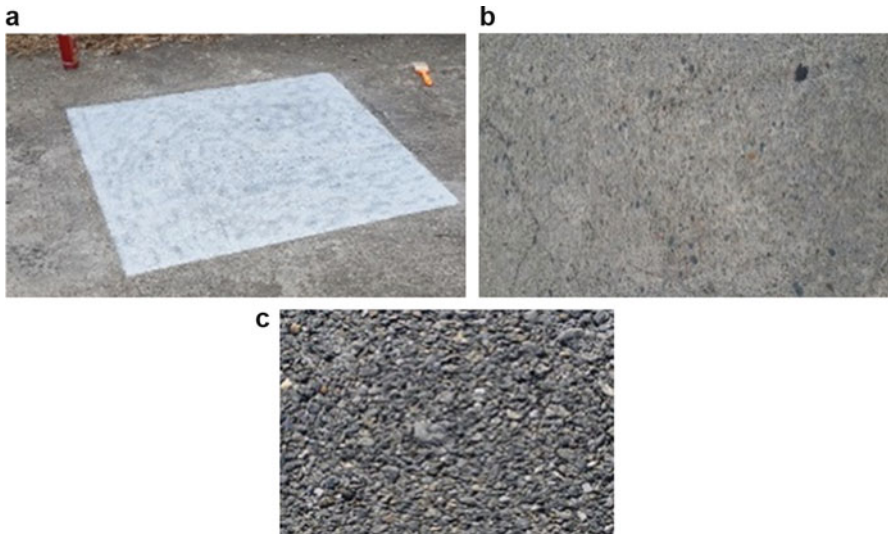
(a) High-reflective paved concrete pavement, (b) concrete pavement, and (c) asphalt pavement
